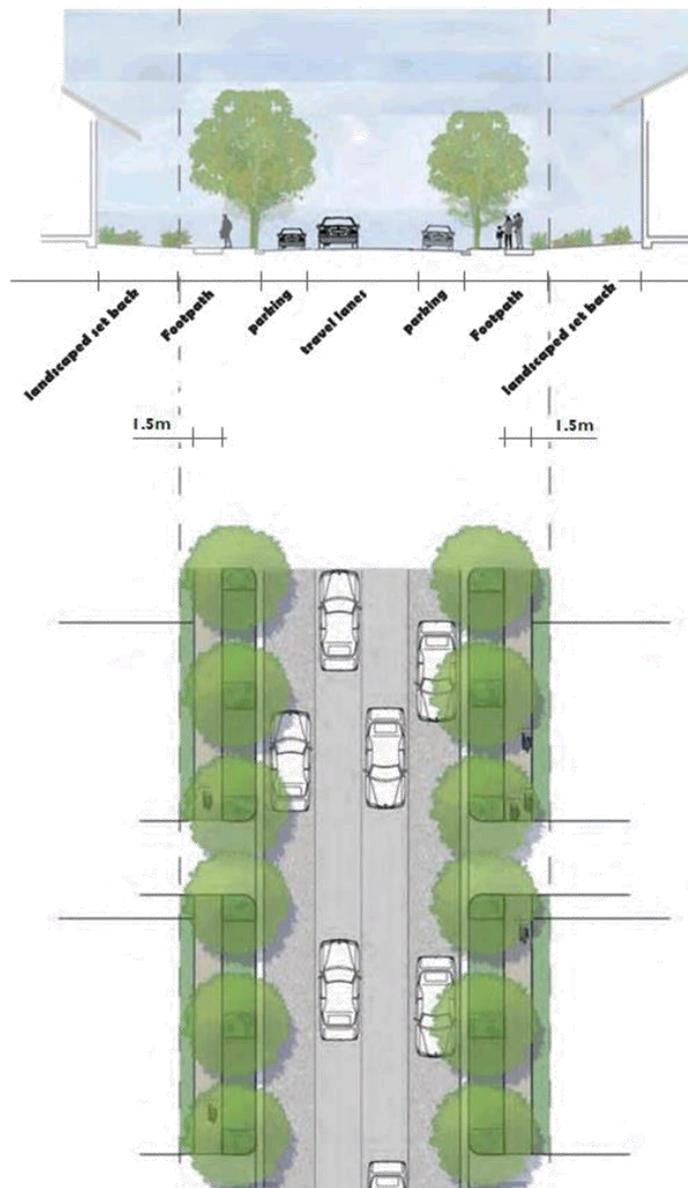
Minor local street (predominantly in residential areas). Opportunities for street tree planting is constrained by the location of services and driveways. It is desirable to achieve a minimum of one street tree per lot in residential streets to achieve a continuous cover. It is recommended that a uniform species is used to maximise visual impact.
